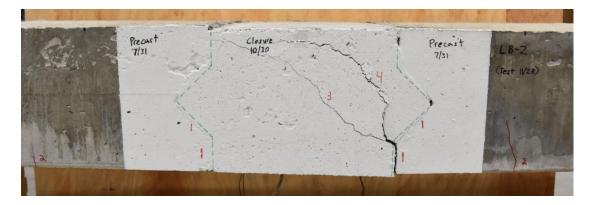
Beam Cracking – Specimen LB-2
